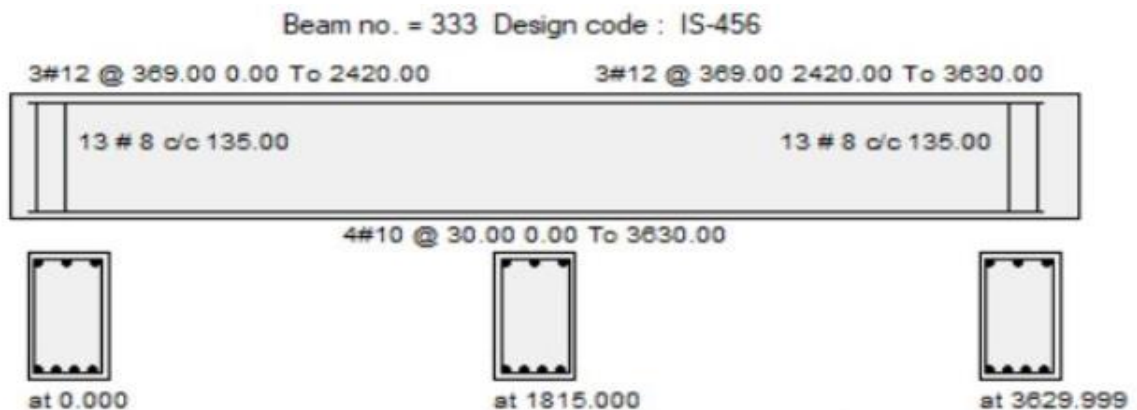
Longitudinal reinforcement schedule for beam 333 (Static)
